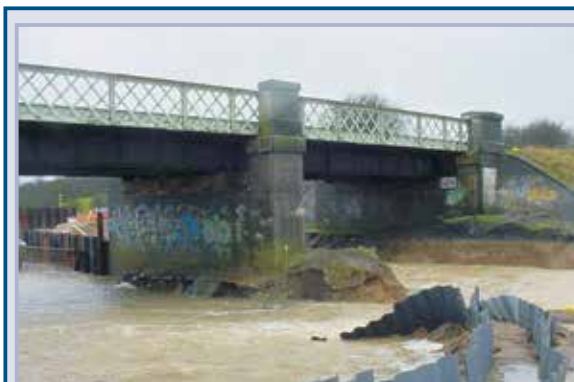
Flooded construction site (courtesy BAM Nuttall Ltd)
